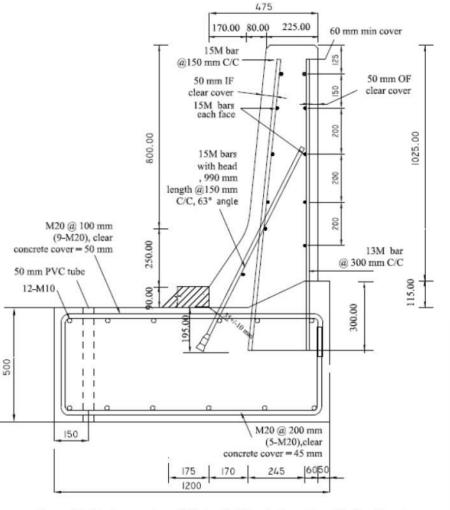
Barrier specimen B-2 details (Exterior Location - No Cantilever)
